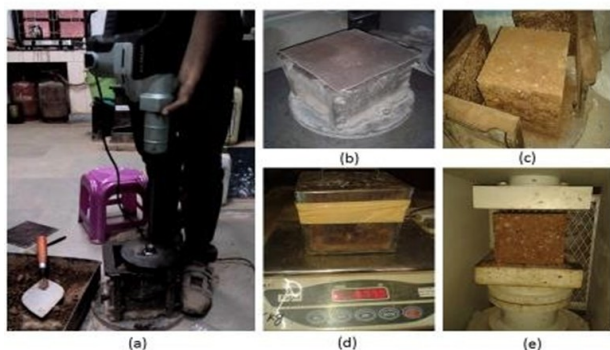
Sequences involved in preparation and testing of UCS of cube specimens (a) Compaction of materials in a cube mould using a vibratory hammer, (b) cube mould covered with a metal plate (160 mm x 160 mm x 3 mm), (c) removal of specimen from the mould after 24 hours, (d) weight measurement of cube specimen inside a properly sealed curing tin (160 mm x 160 mm x 155 mm), (e) Unconfined compression test of specimen (after 7 days) using a Compression testing machine
